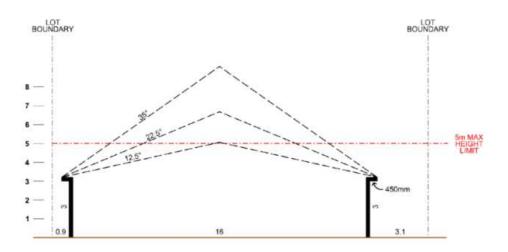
Five (5) metre maximum building height limit compared to roof pitches.
